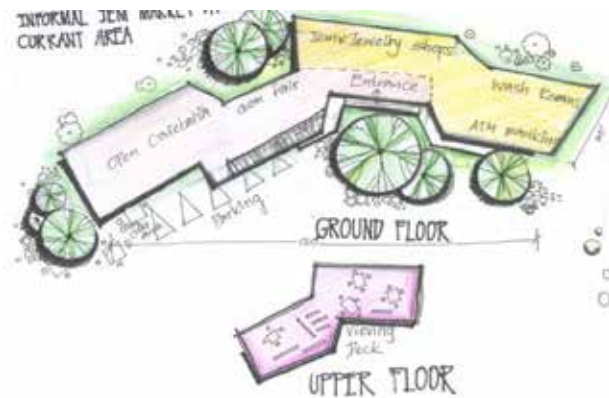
Layout Plan - Proposed Nivithigala Development Plan
